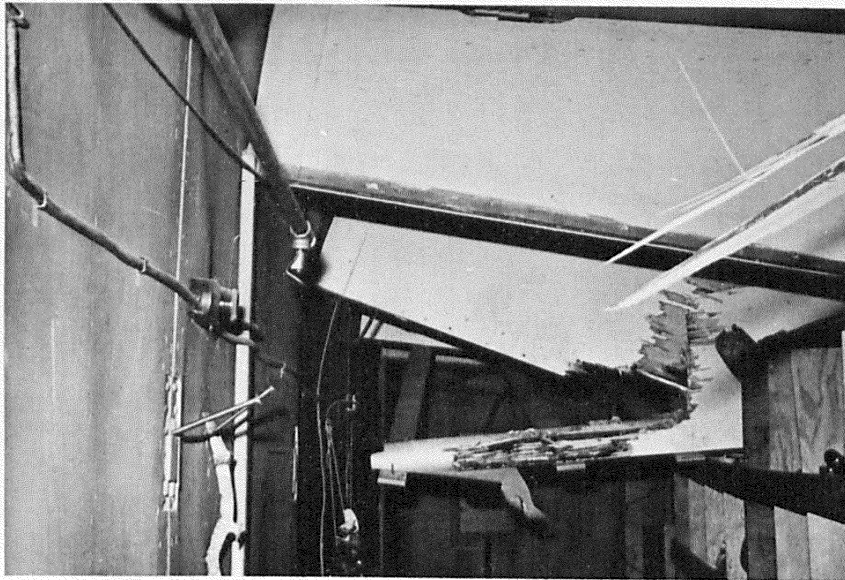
Stairway to escape hatch at end of Trench 9.
